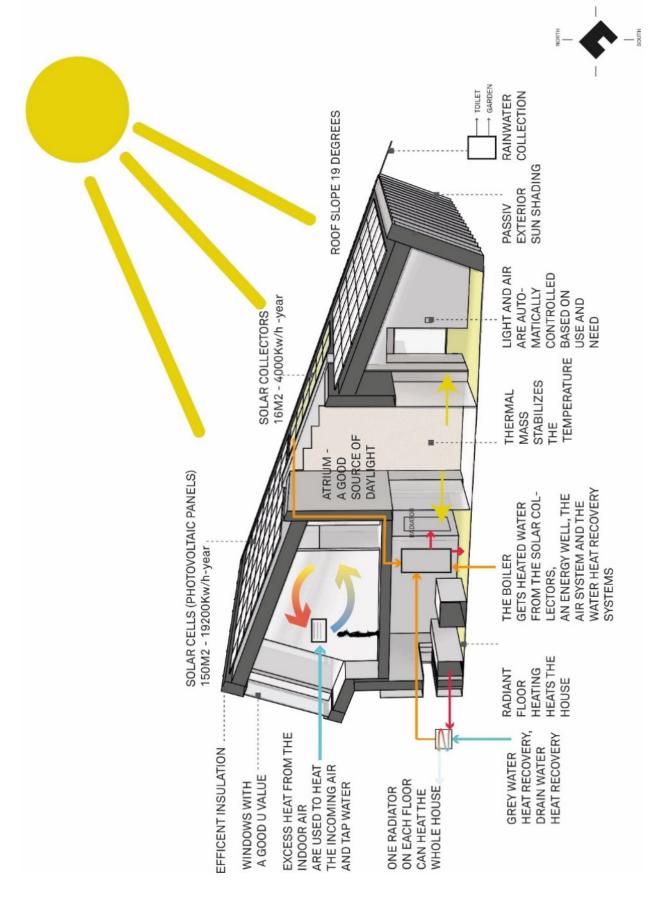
Illustration of the building concept for the ZEB pilot house Larvik. Source: Snøhetta.
